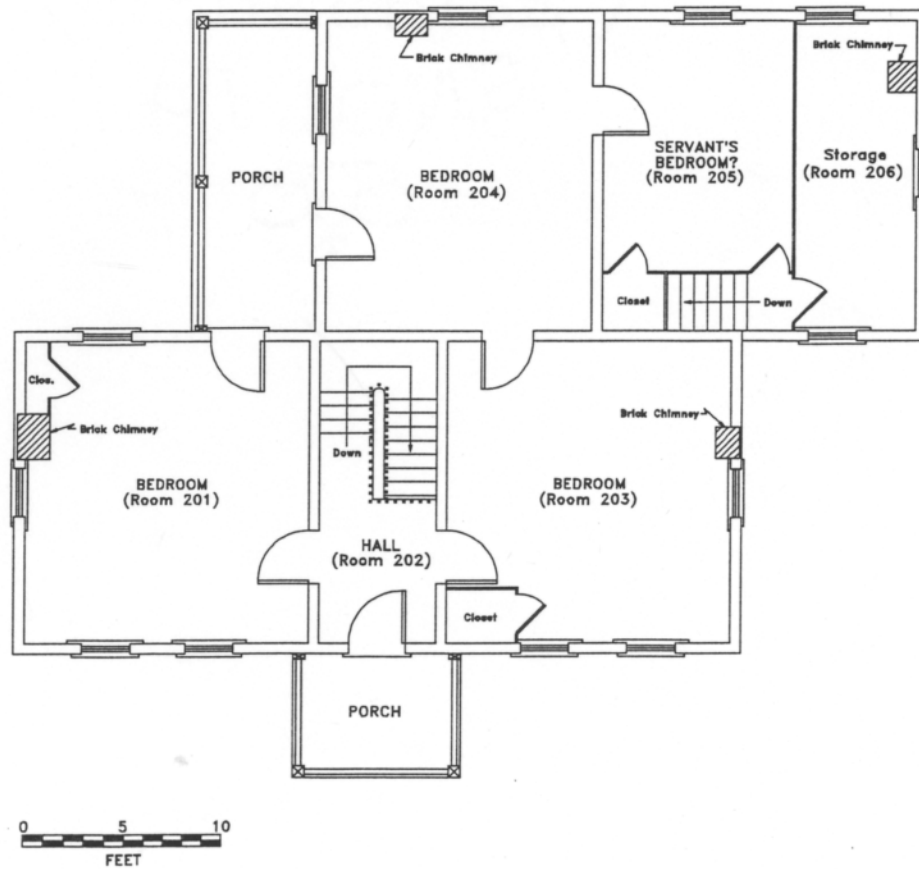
Second floor plan of the Williamson House, showing construction of the addition, ca. 1900.
